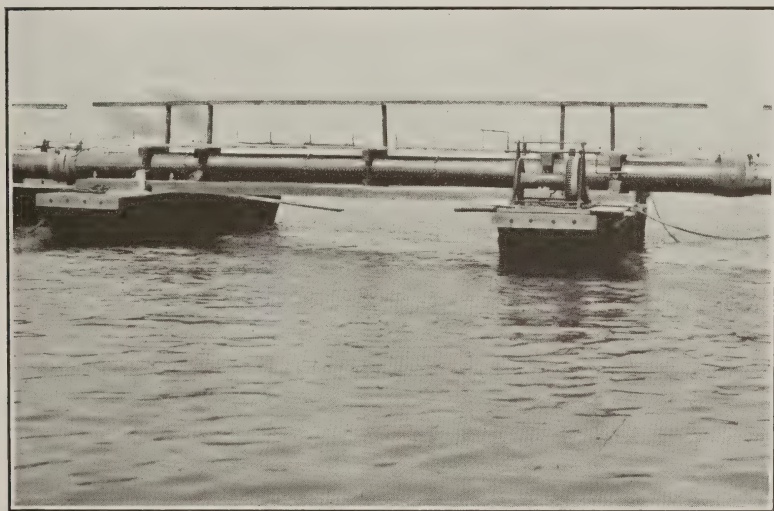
Pipe line, showing one 40-foot length supported on two pontoons, one of which is fitted with a windlass.
